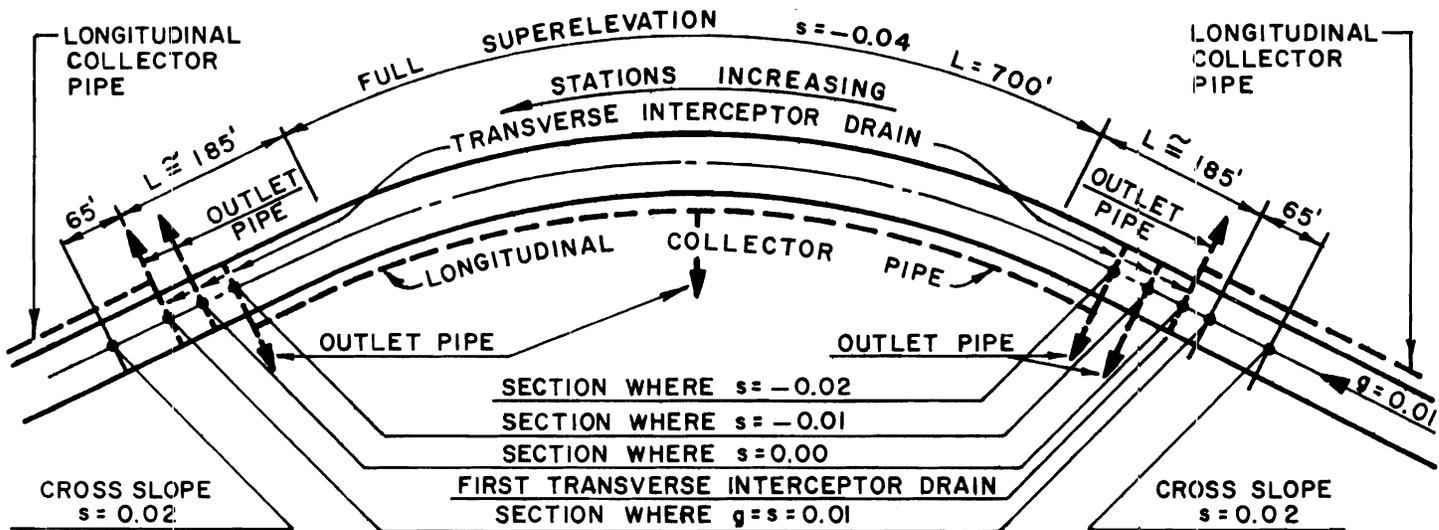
Subsurface Drainage Design for Example No. 3
